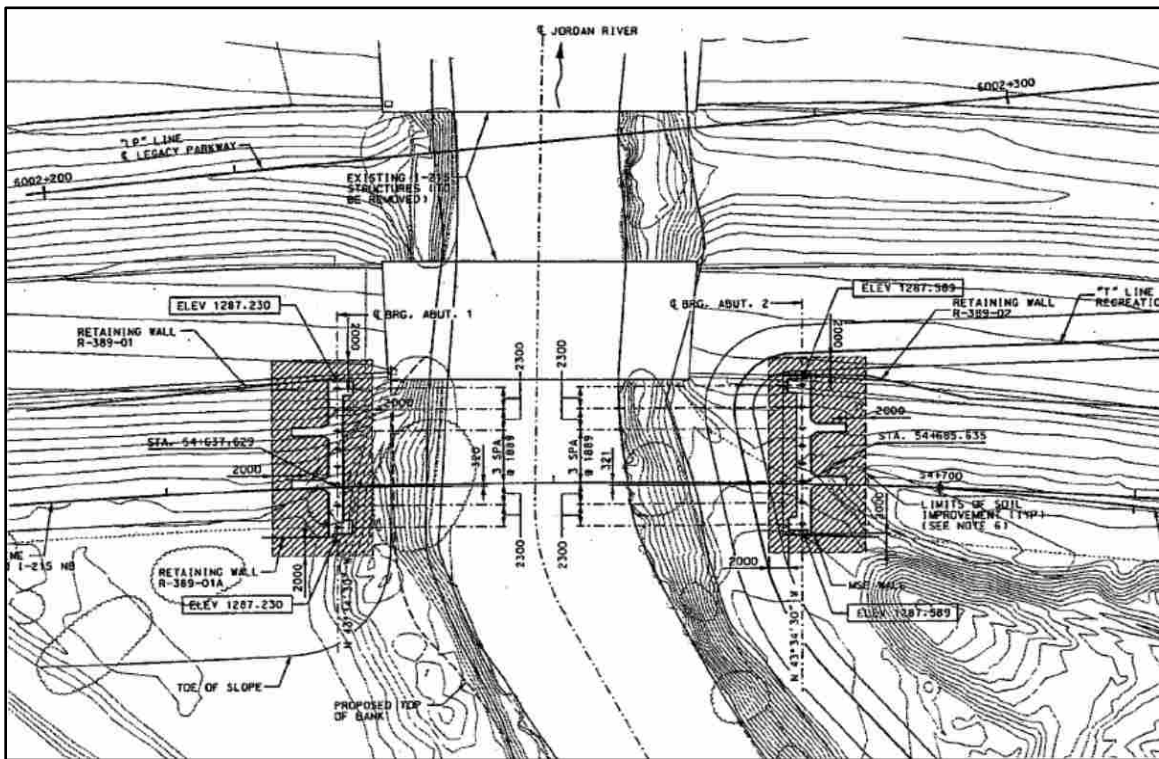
Plan view of “improvement areas” around abutments at a bridge site on the Legacy Parkway project north of Salt Lake City, Utah (Higbee 2007)
